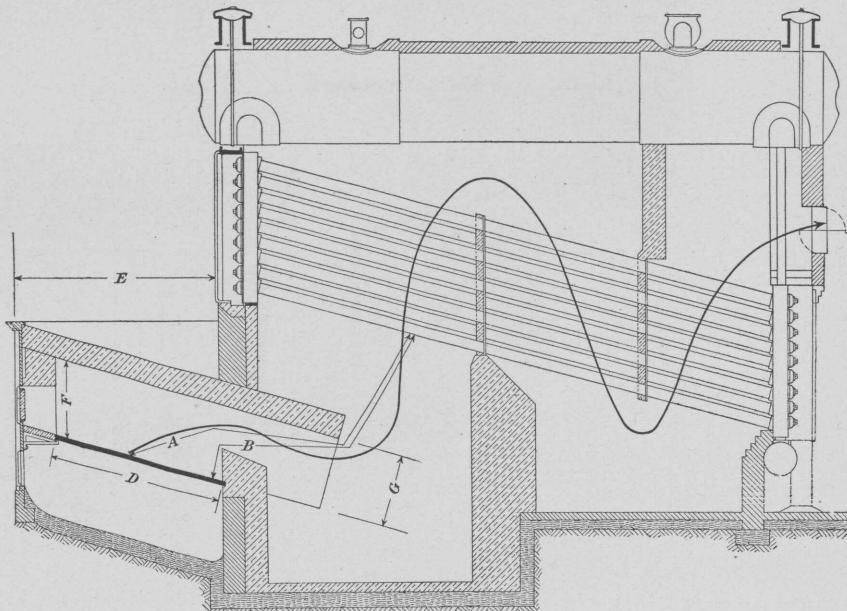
A hand-fired furnace and Babcock & Wilcox boiler.
